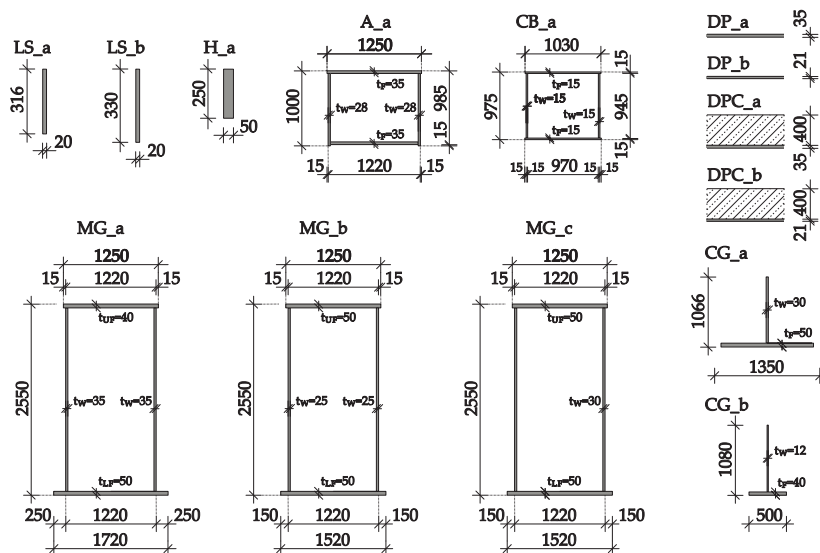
Arch bridge — cross sections— longitudinal stiffeners (LS), deck plate (DP), hangers (H), arches (A), cross beams (CB), cross girders (CG) and main girders (MG)
